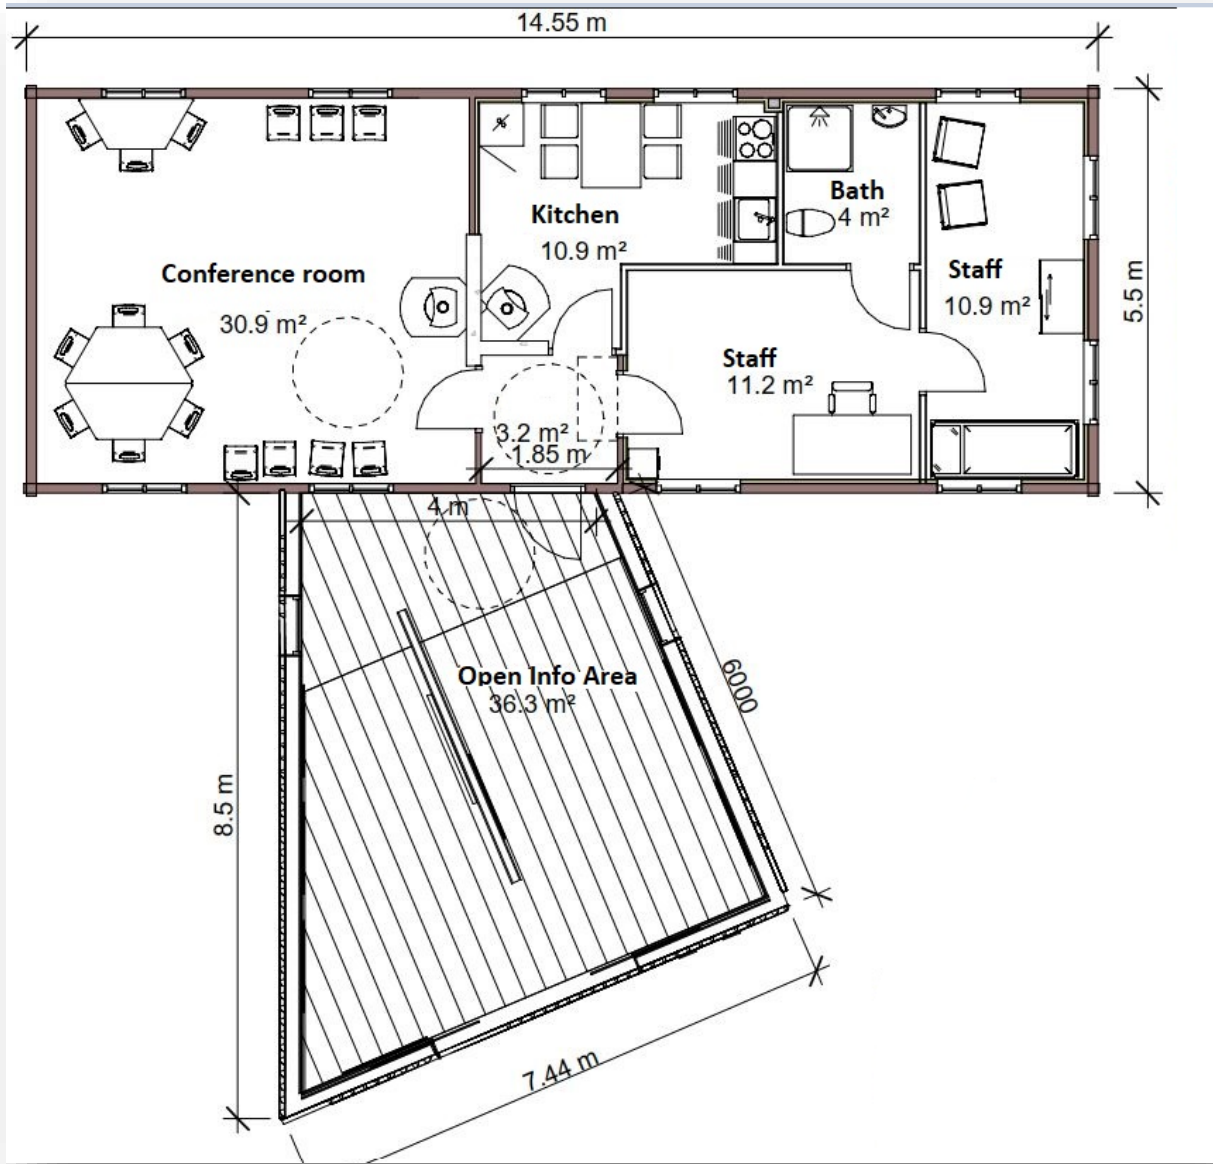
The refurbished main building, with floor plan for a new open entrance dedicated to information posters.
